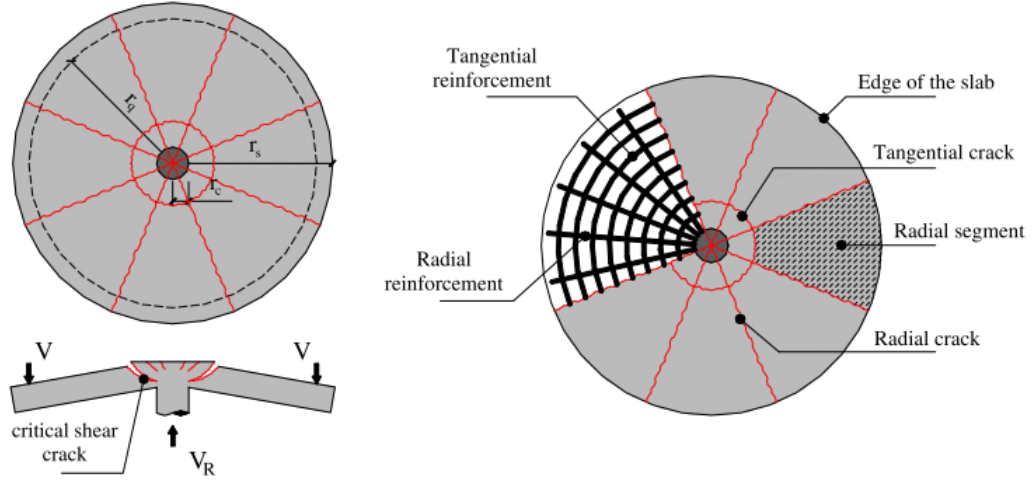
RC slab with axisymmetric structural conditions, crack pattern at ultimate limit state and reinforcement arrangement. [13]
